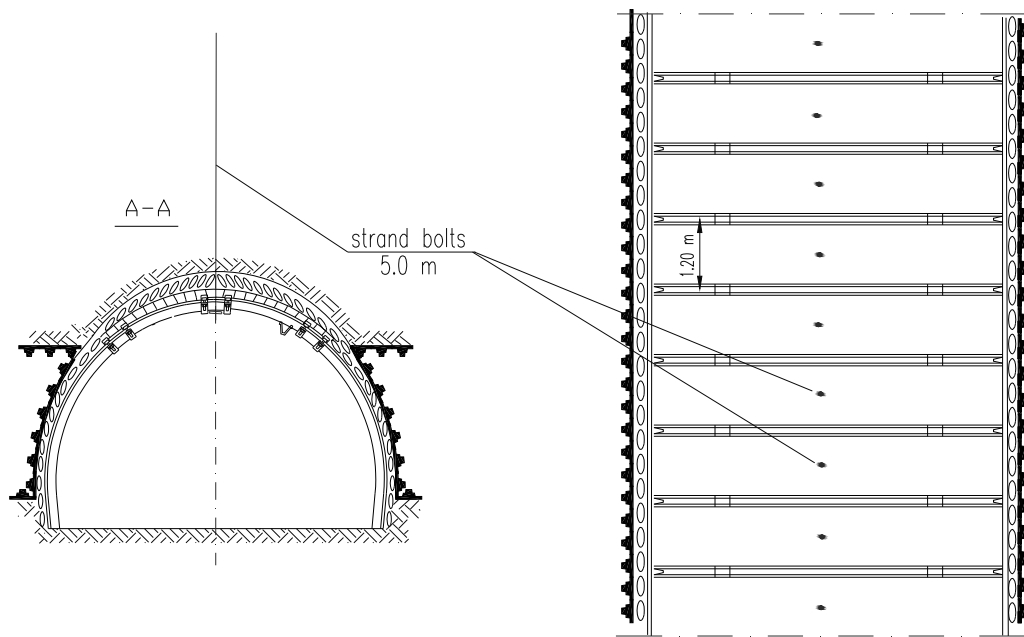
Support system in the connecting roadway Z3 (seam 510/2).
